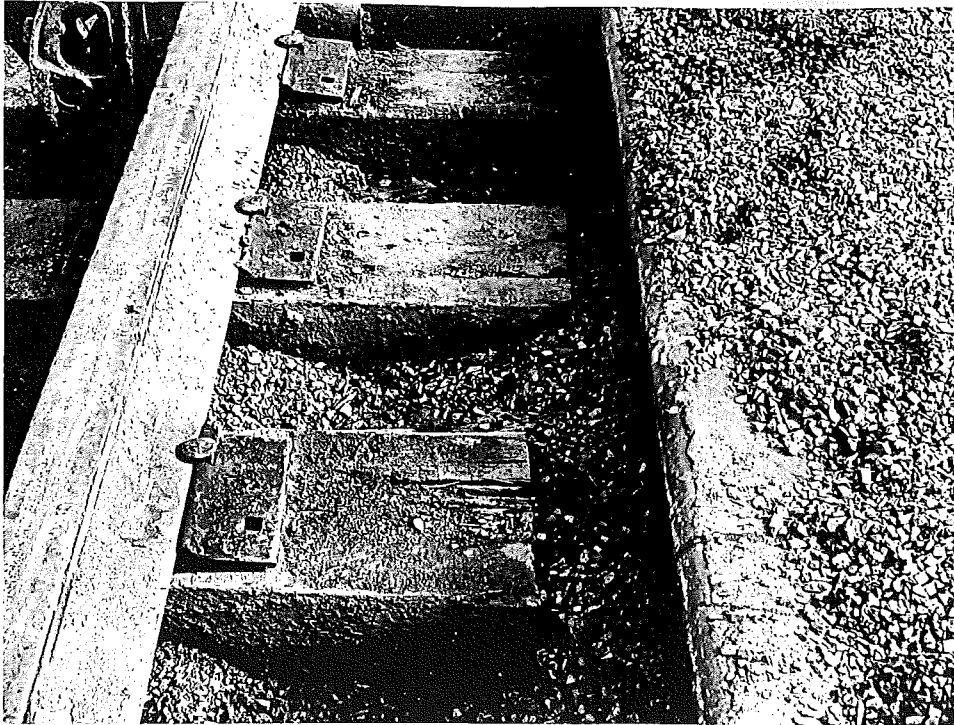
Condition of exposed ties. Note sheared-out bolt holes in top and center tie. Bolts missed the bottom tie completely.
